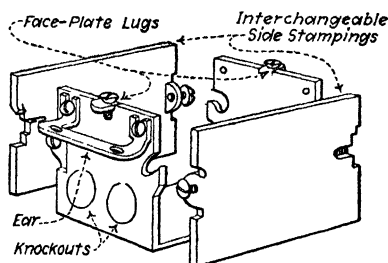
Sectional snap-switch box with both sides removable. (*Chicago Fuse Mfg. Co., Chicago, Ill.*)
